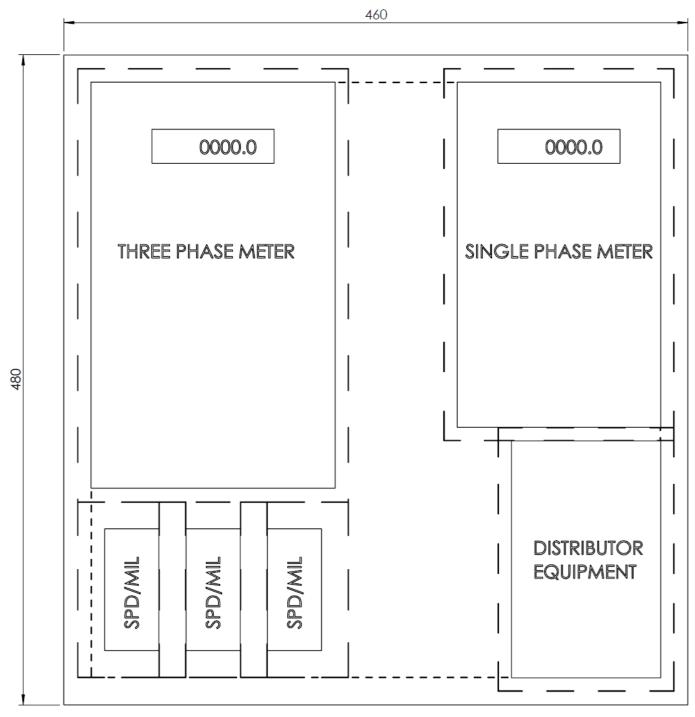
Typical Panel Layout for Residential House with Multi-phase, single phase meters and load control
